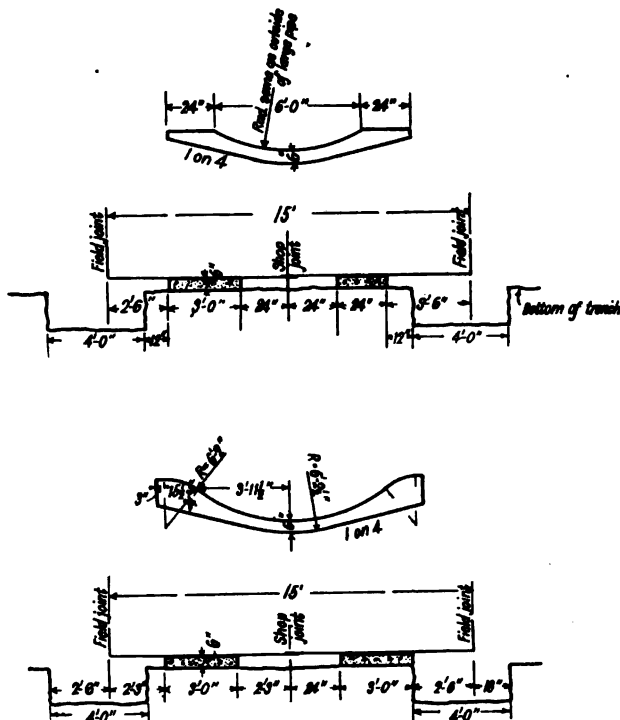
CONCRETE CRADLES FOR PIPE SIPHONS.
